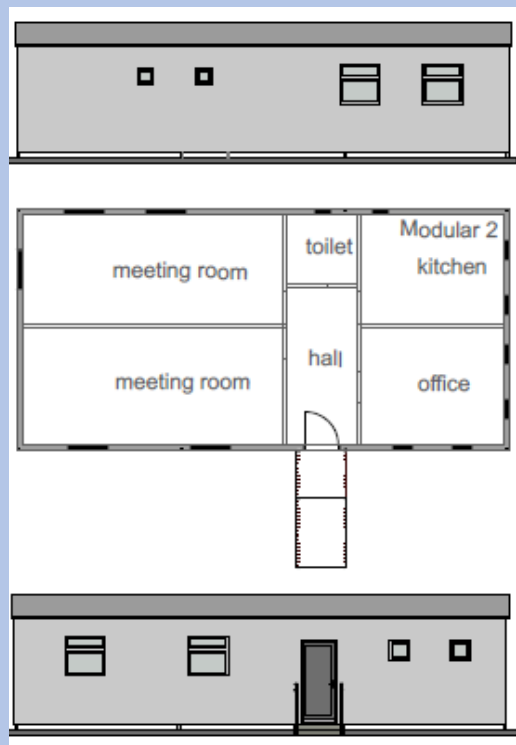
Zone 5. Sample elevation and plan of modular buildings (Image not to scale).
